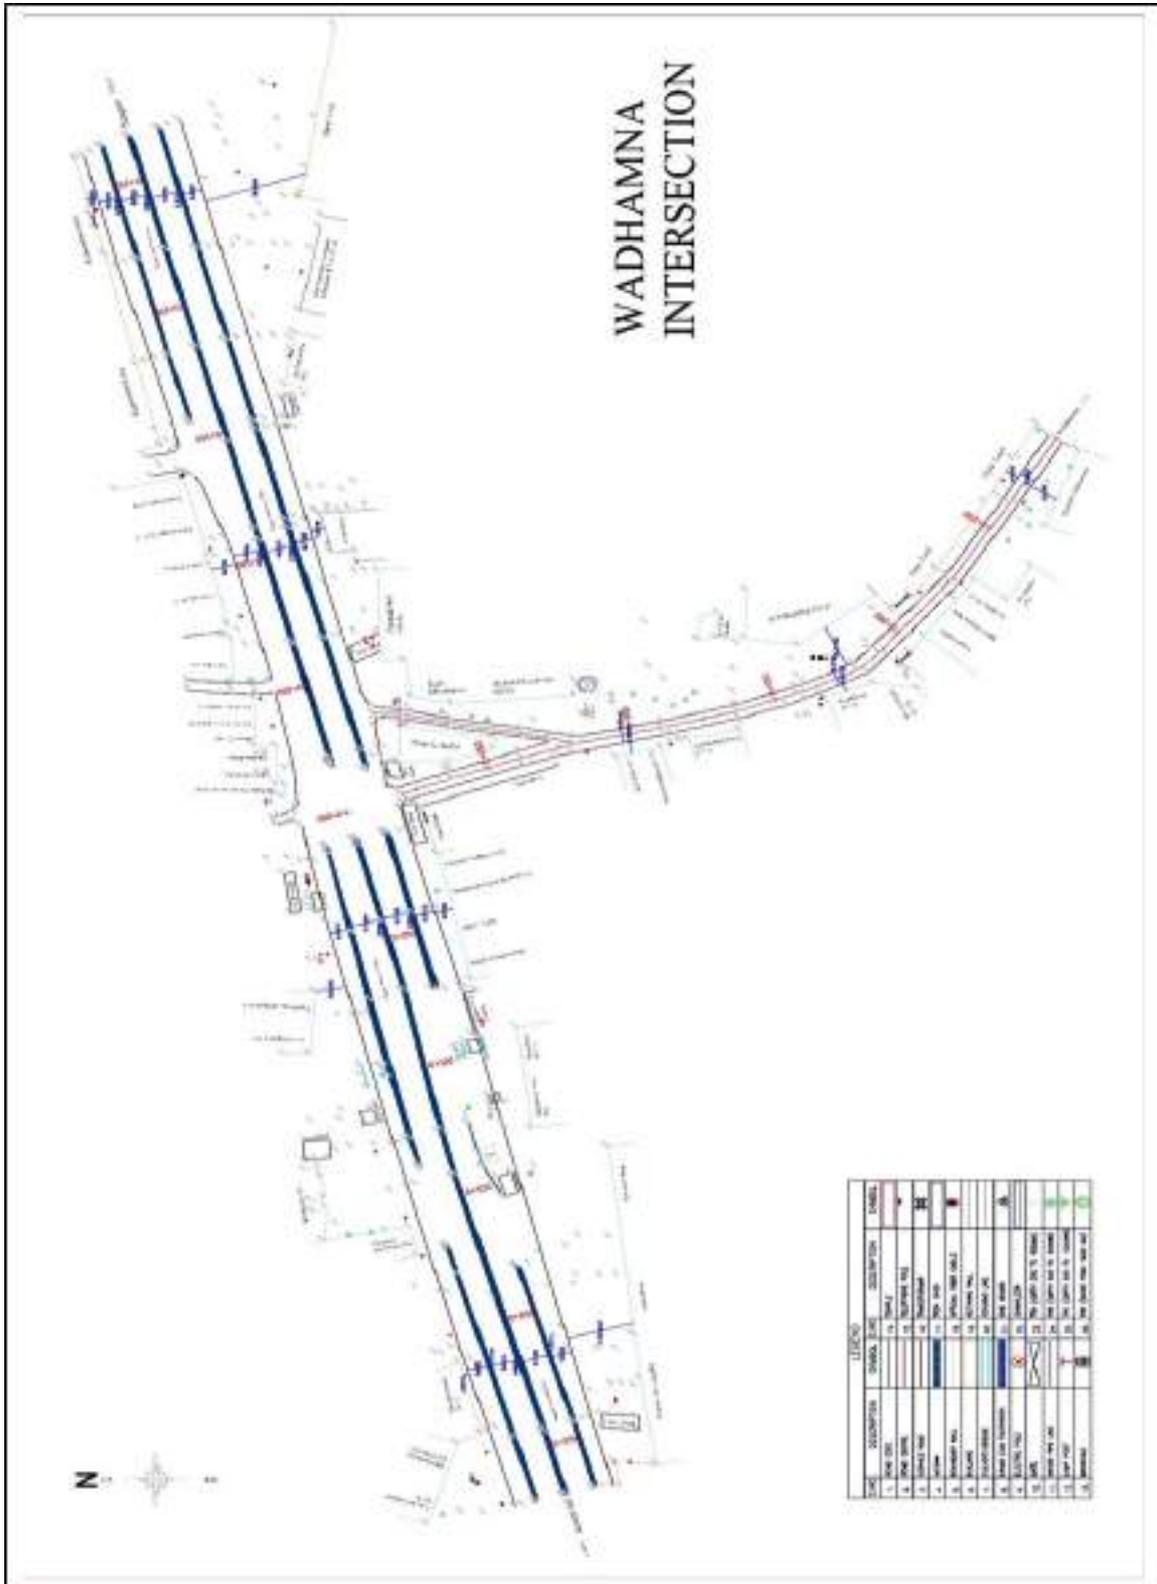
Physical Survey Plan of the Wadhamna Intersection
